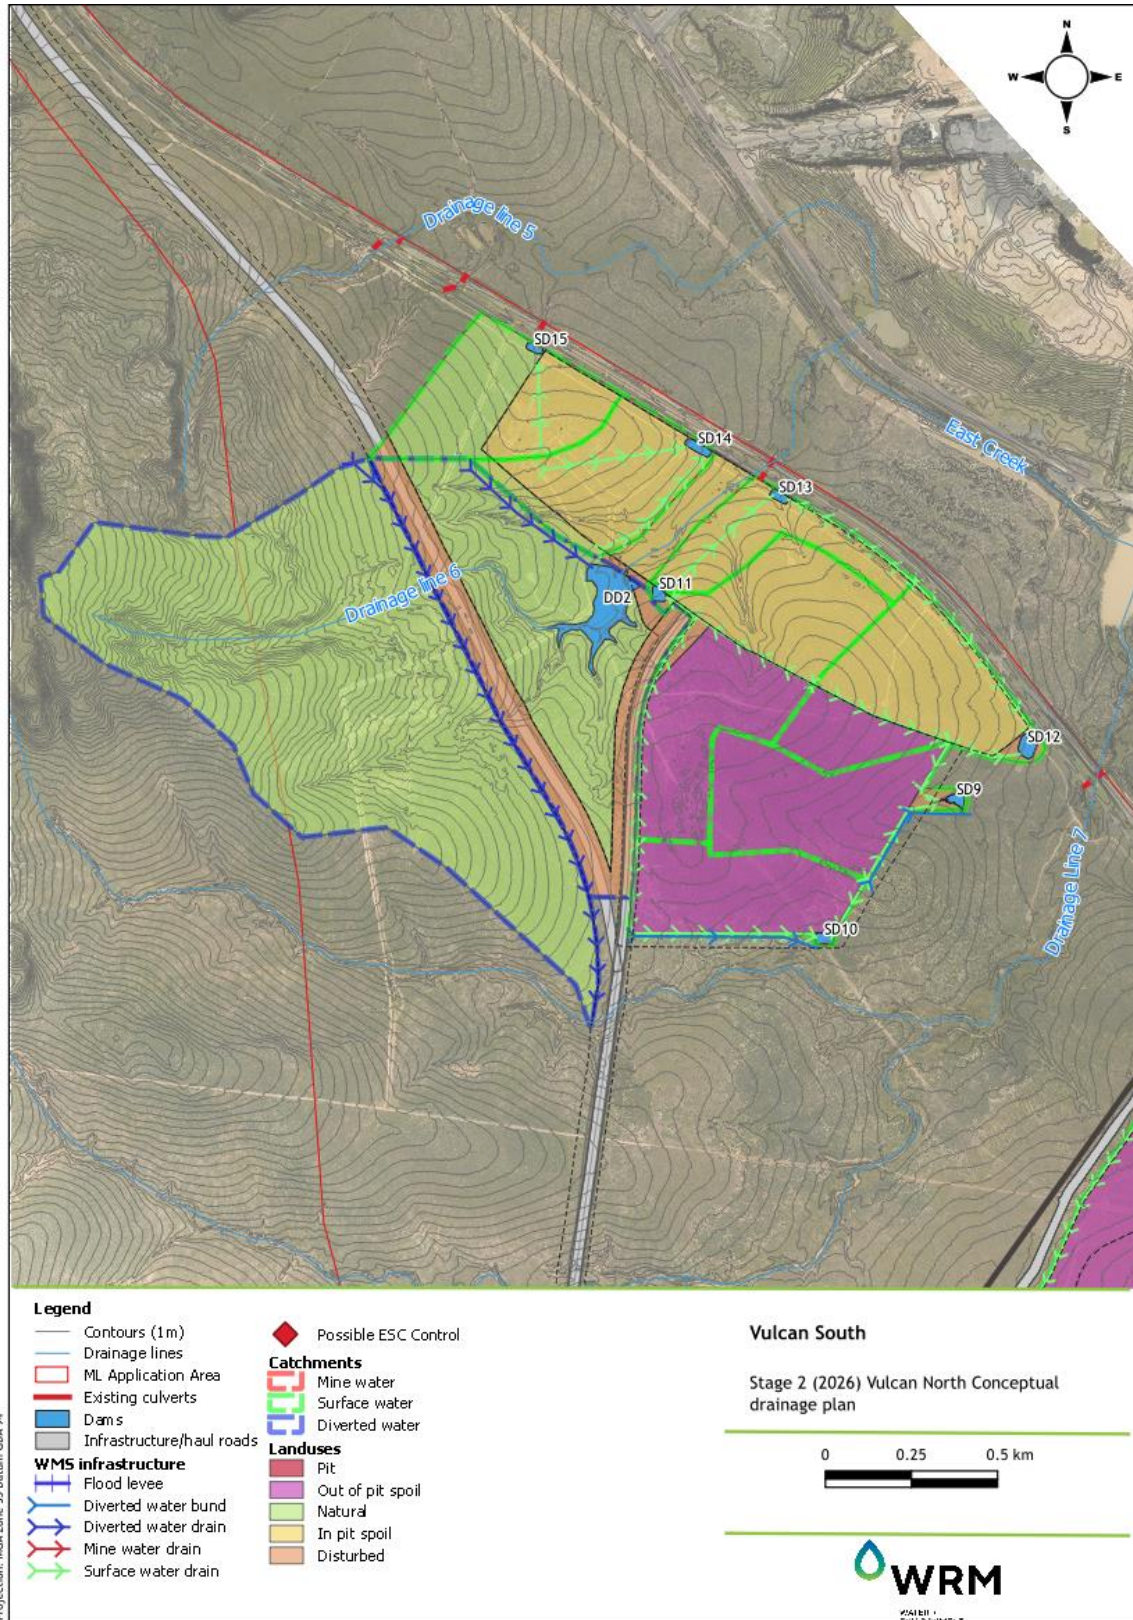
Stage 2 VS North mining area conceptual drainage plan
